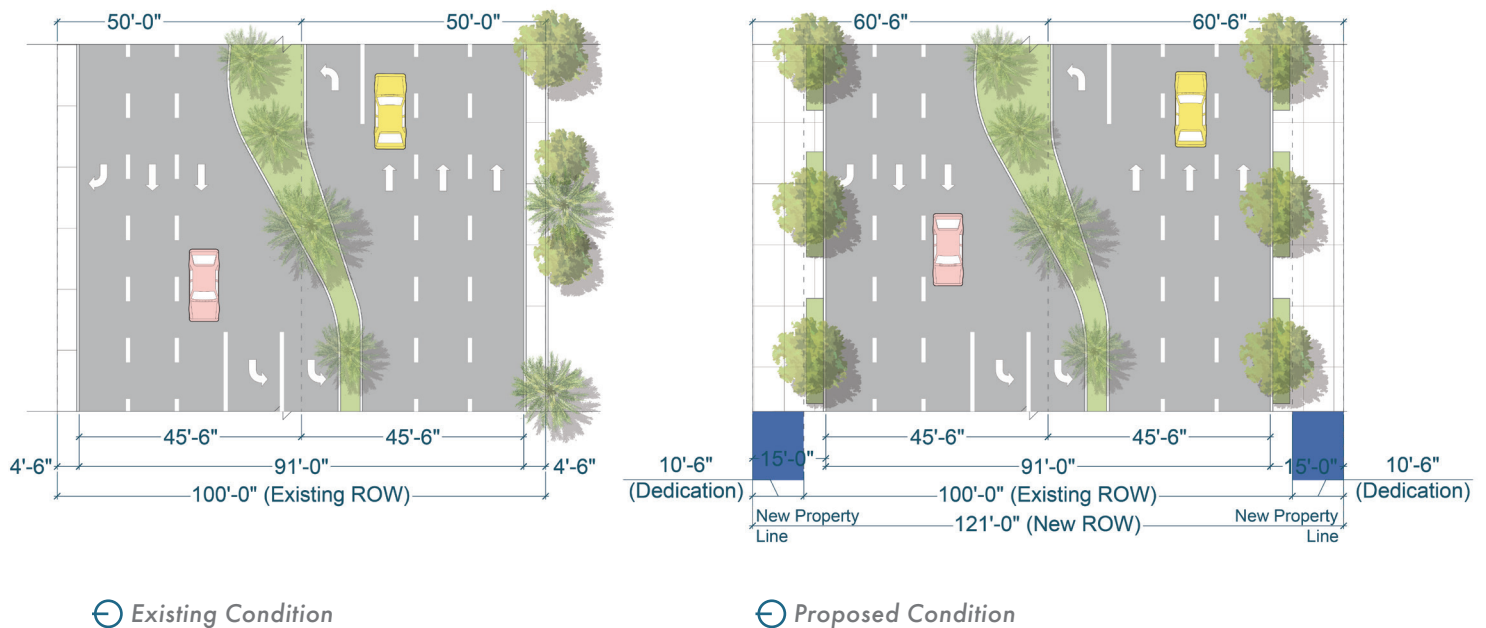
Slauson Avenue Right-of-Way Design (Sepulveda Boulevard to Transit Center Driveway)
